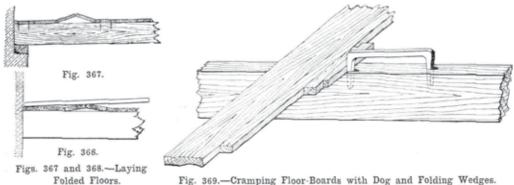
Cramping Floor-Boards with Dog and Folding Wedges.
